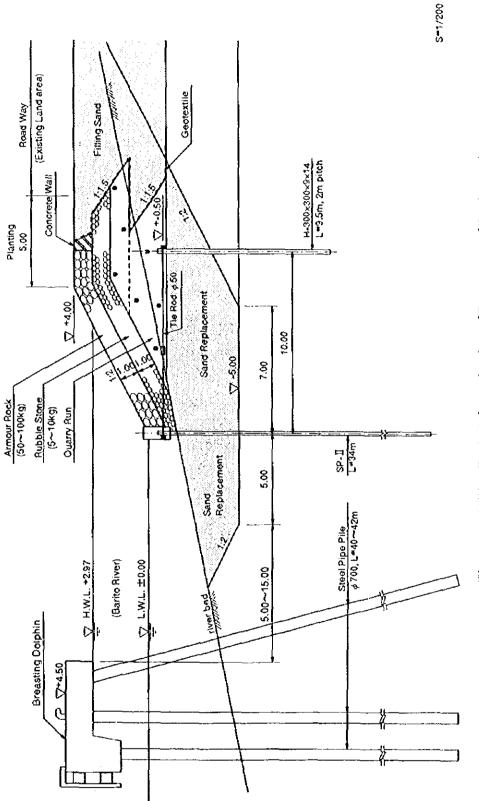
(2) Typical Cross Section of Revetment of Banjarmasin
